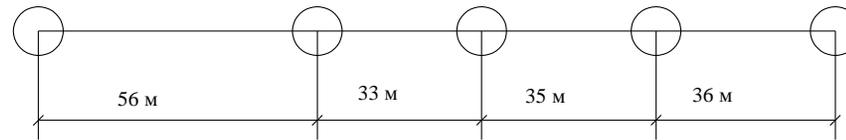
Schematic layout of lighting towers in Ul. Vysokaya to pl. Lenina, City of Novogrudok (layout – one-sided, luminaire installation altitude – 8.5 m)
